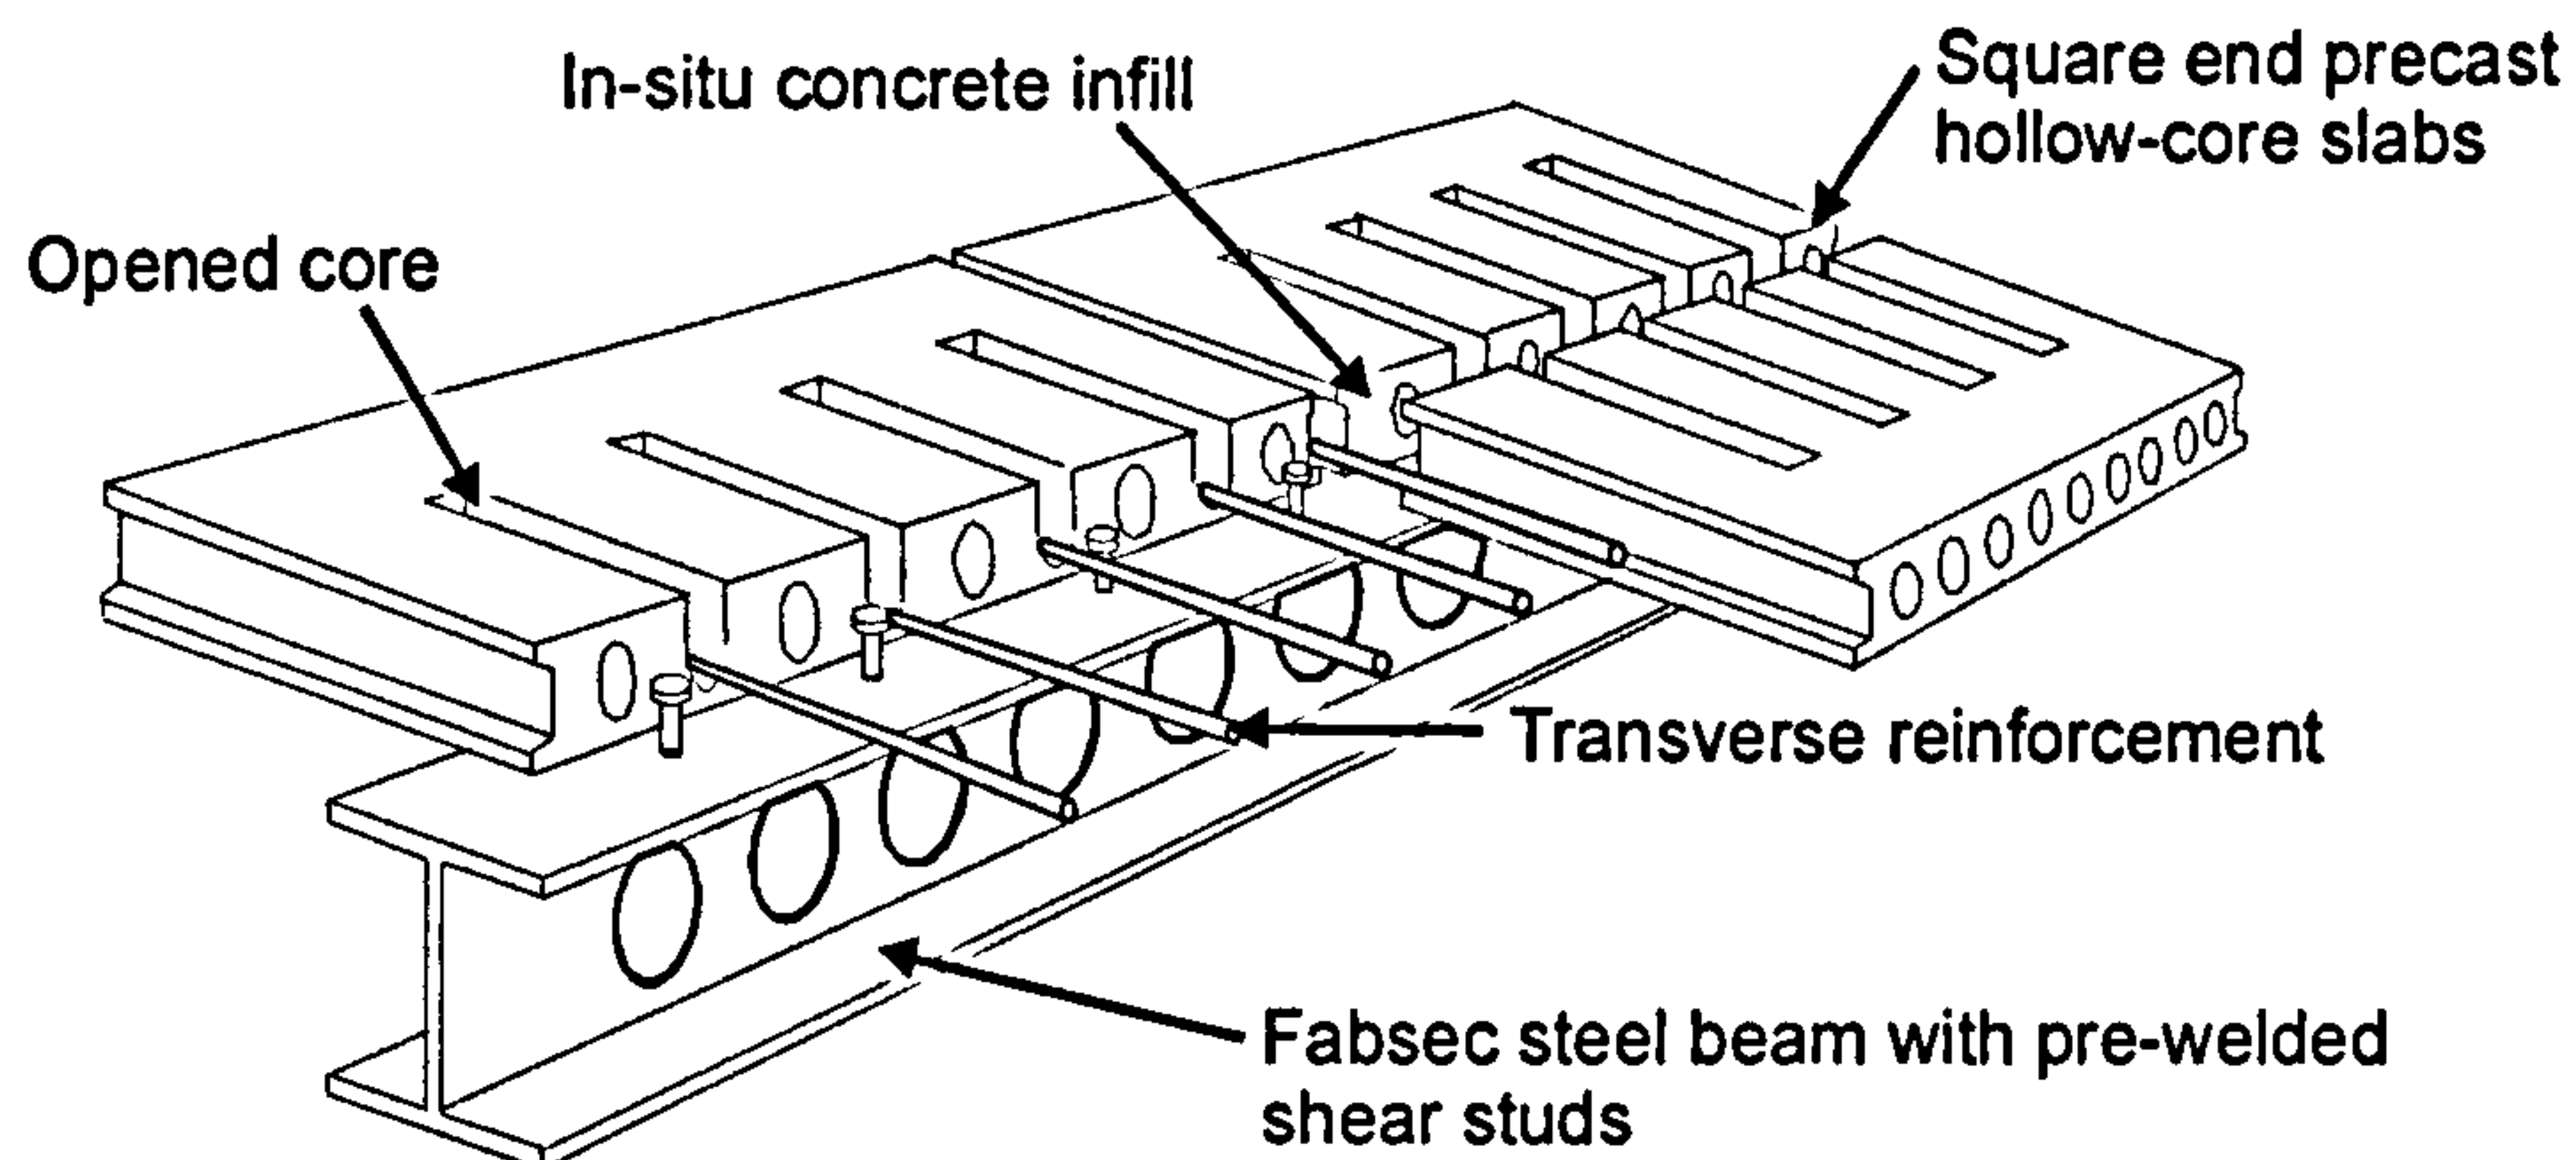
Composite Beam with Precast Hollow-Core Slabs
